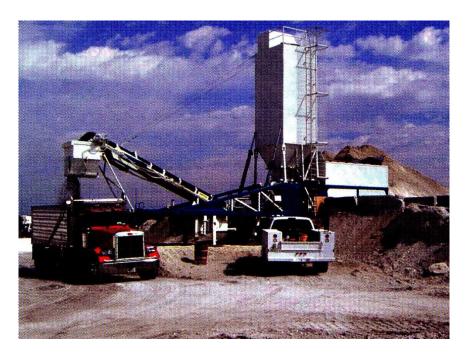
Typical central mixing plant for soil cement (Halsted et al. 2006)
